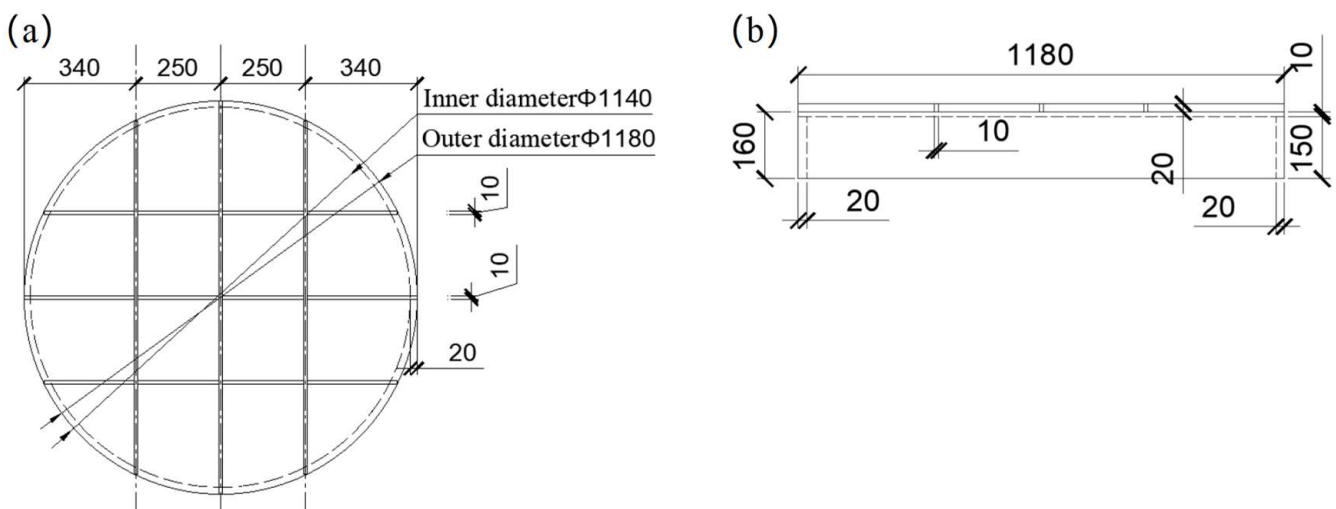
Design dimensions of the cover plate (mm). (a) Top view; (b) Side view.
